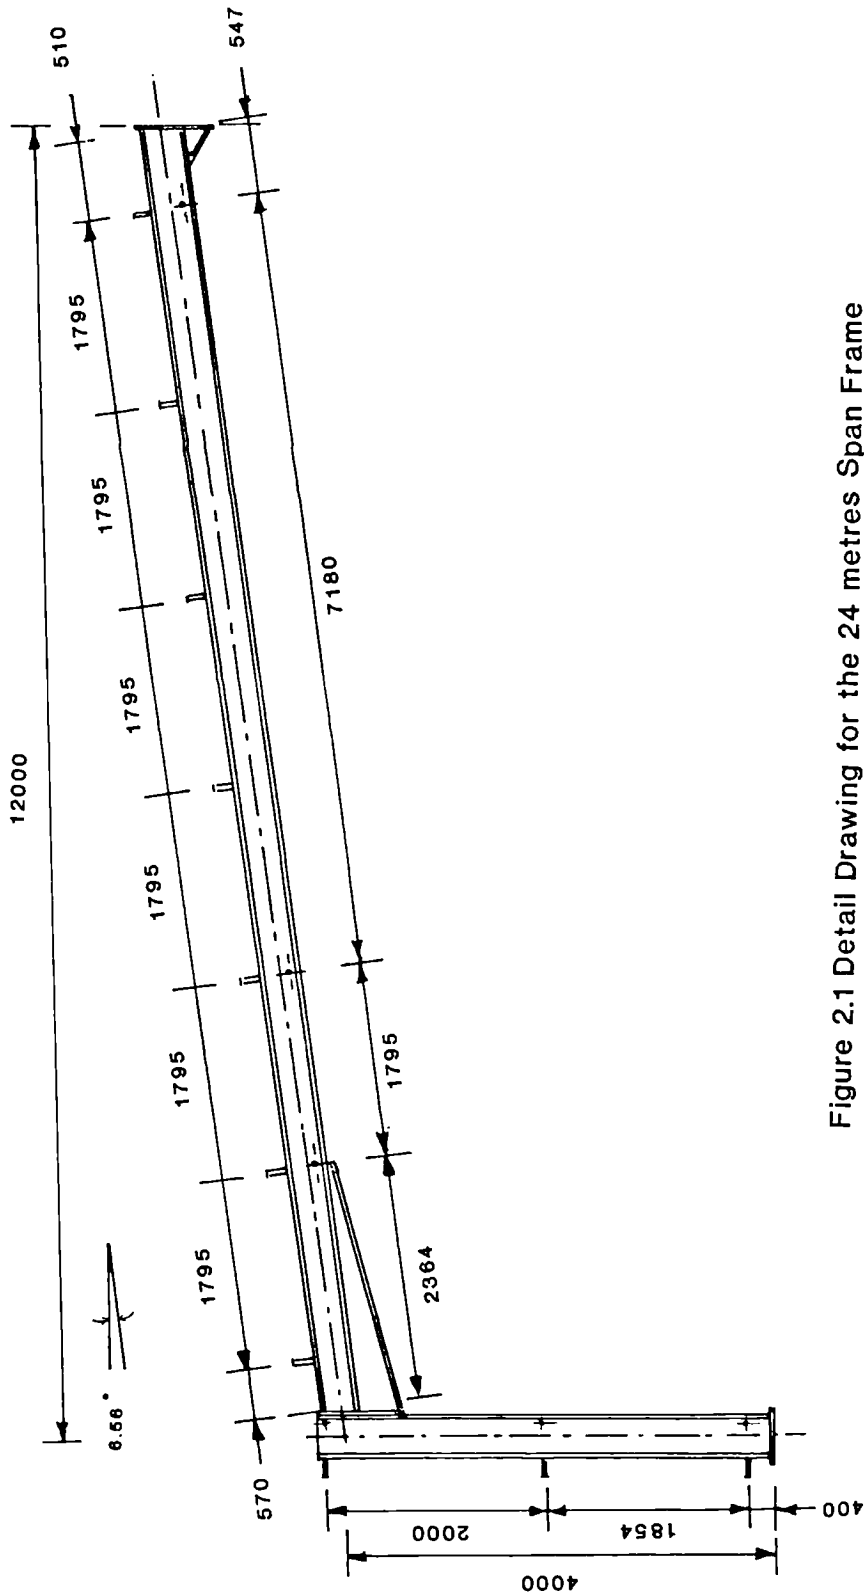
Detail Drawing for the 24 metres Span Frame
